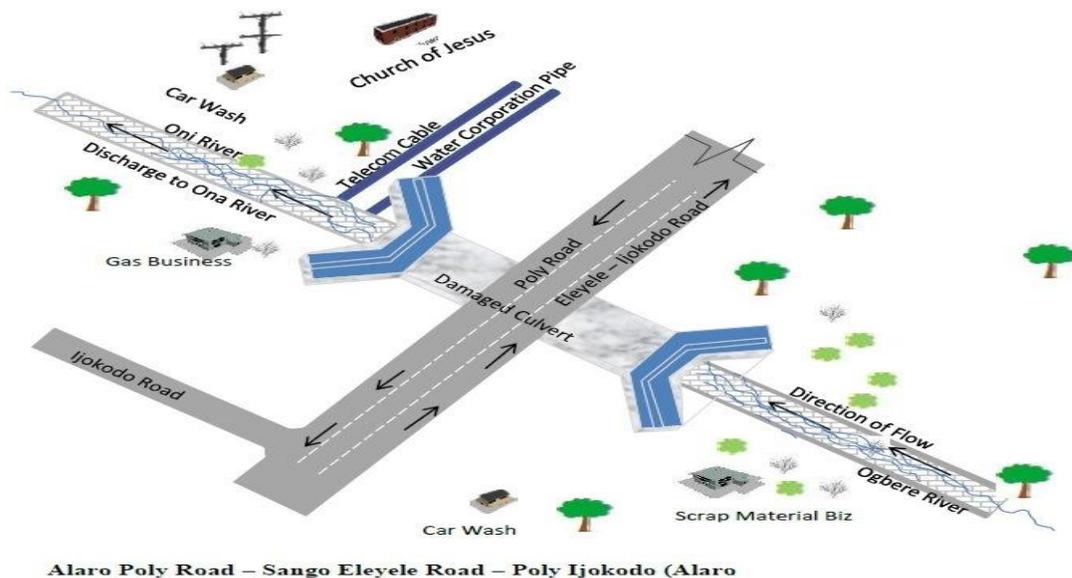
Alaro Poly Road - Sango-Eleyele Road - Poly Ijokodo (Alaro Stream) Bridge Schematic Layout
